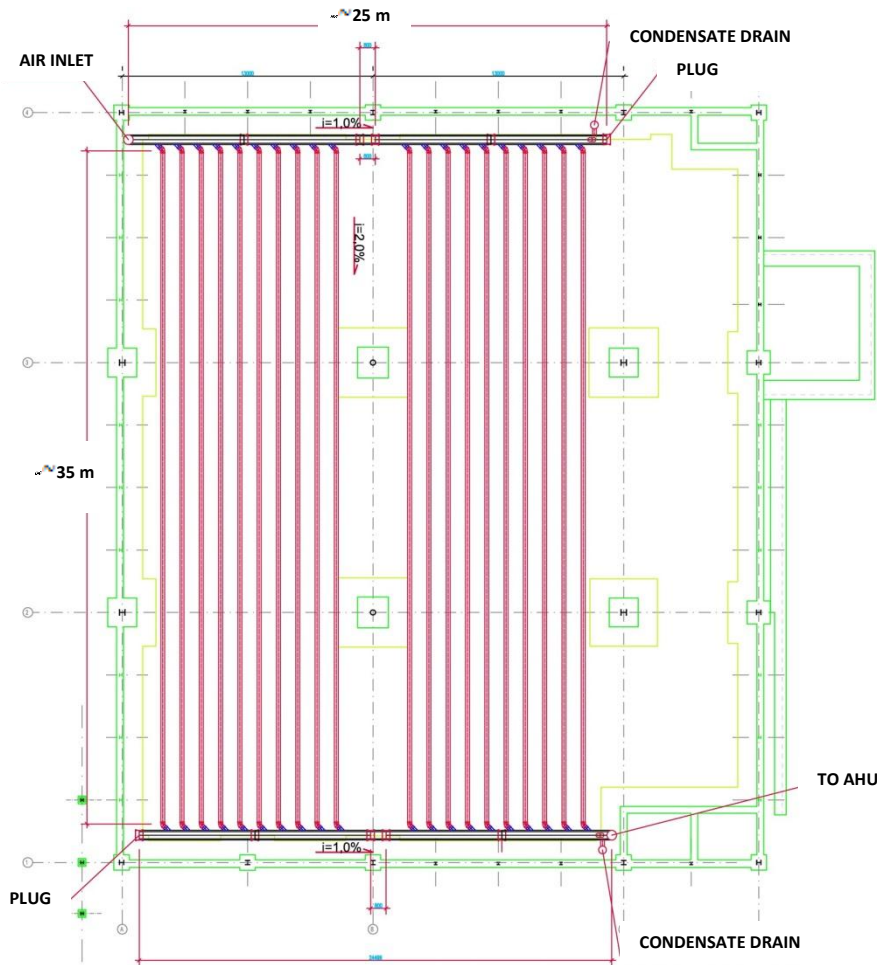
Layout of EAHE installation underneath the floor of commercial facility “A”
